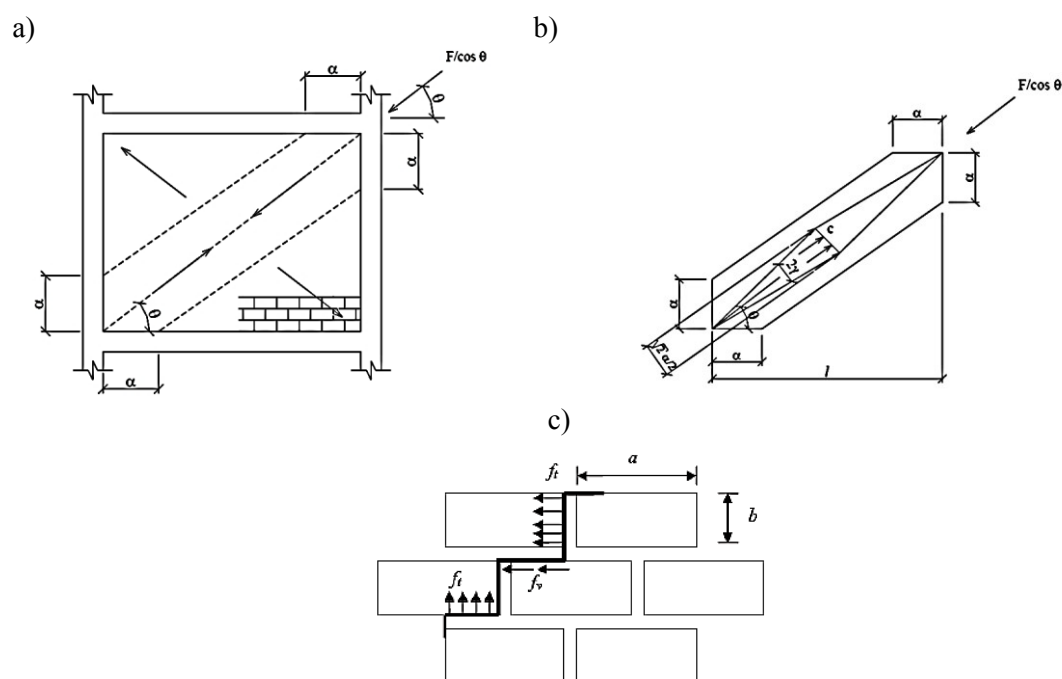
Design model for masonry infilled frame subjected for in-plane loading; a) composite frame-panel b) proposed strut-tie model c) equivalent tensile strength for a typical diagonal step crack [68]
